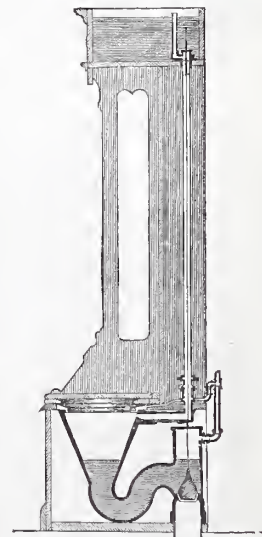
Sectional View of Cabinet, Showing Arrangement of Closet.
